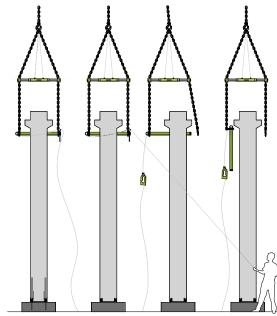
ERECTION OF THE PRECAST CONCRETE COLUMN ON ANCHOR BOLTS' PRE-LEVELED NUTS AND WASHERS (LEFT). RELEASING PROCESS OF COLIFT MOUNTING SYSTEM FROM PRECAST COLUMN (RIGHT).
